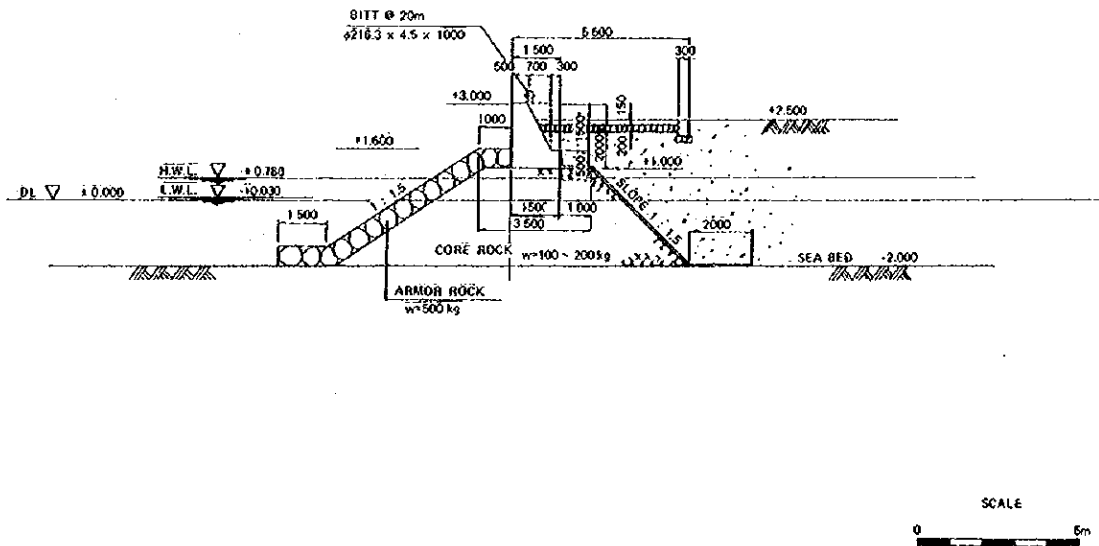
Cross Section of Rock Bulkhead (2) – Zamboanga Port
